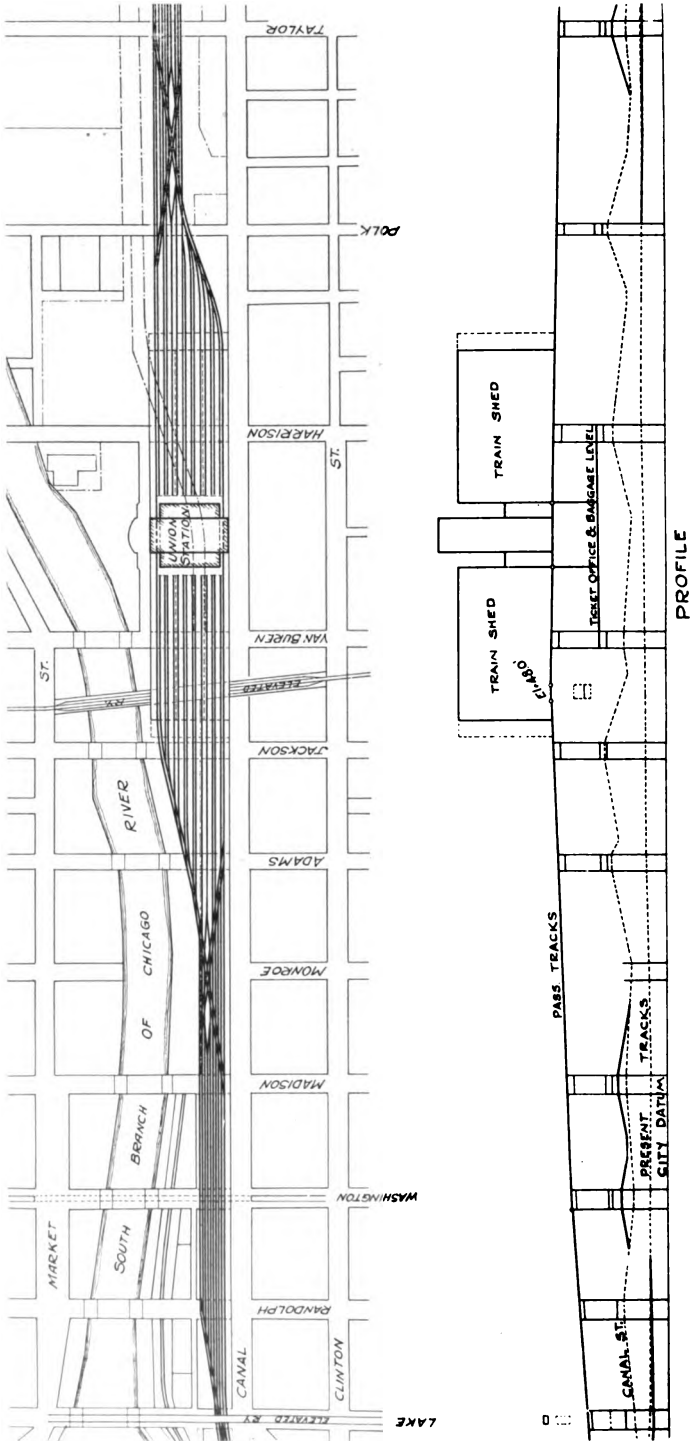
PLAN OF A THROUGH TYPE OF STATION SOUTH OF VAN BUREN STREET.
